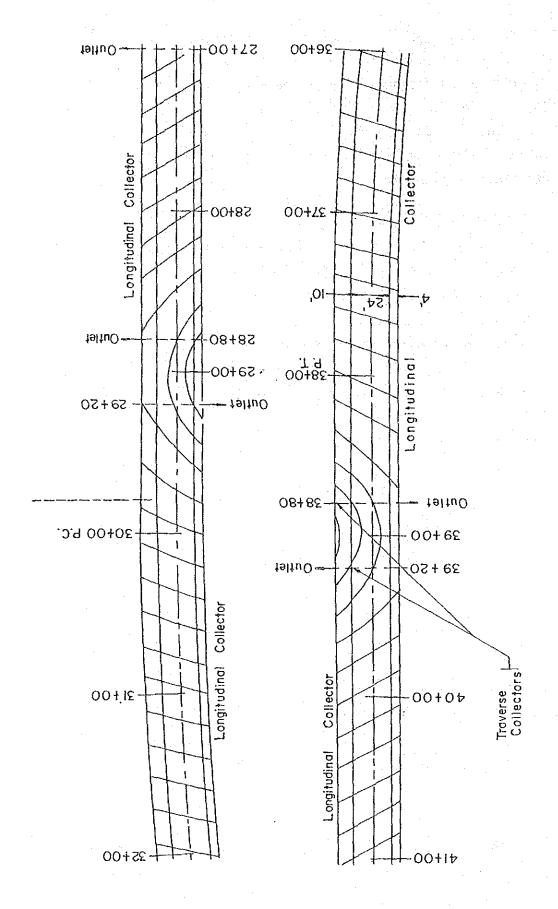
4-2 Layout of Proposed Drainage System Showing Direction of Flow in Drainage Layer
